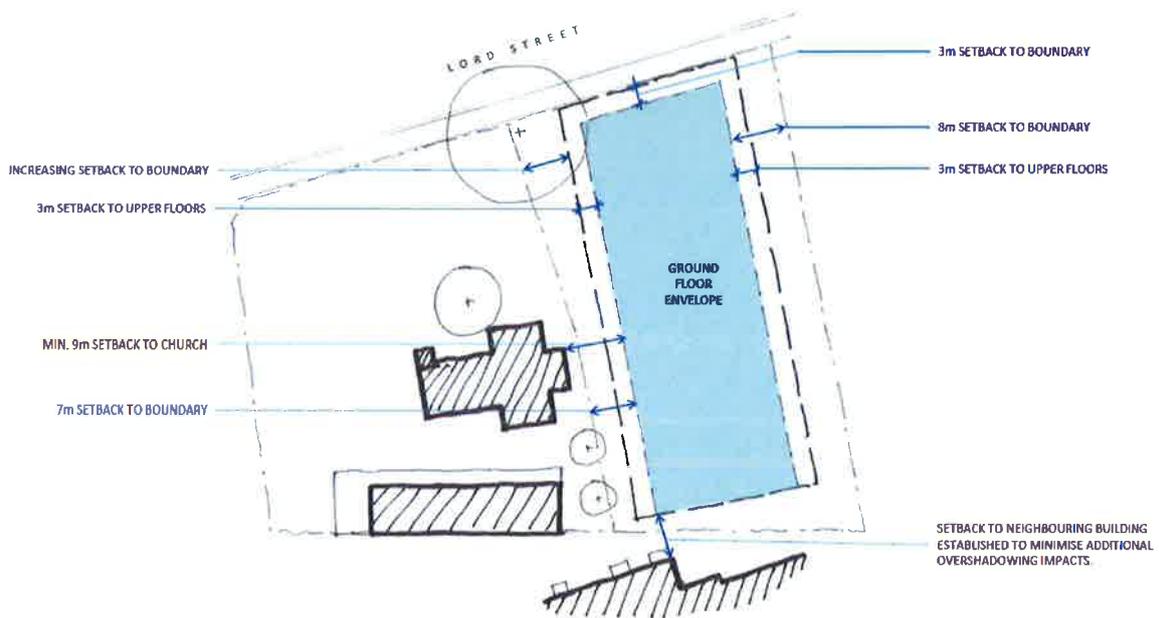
Indicative building envelope and setback – Ground floor (Source: Planning Proposal & BuiltConsult Pty Ltd)
